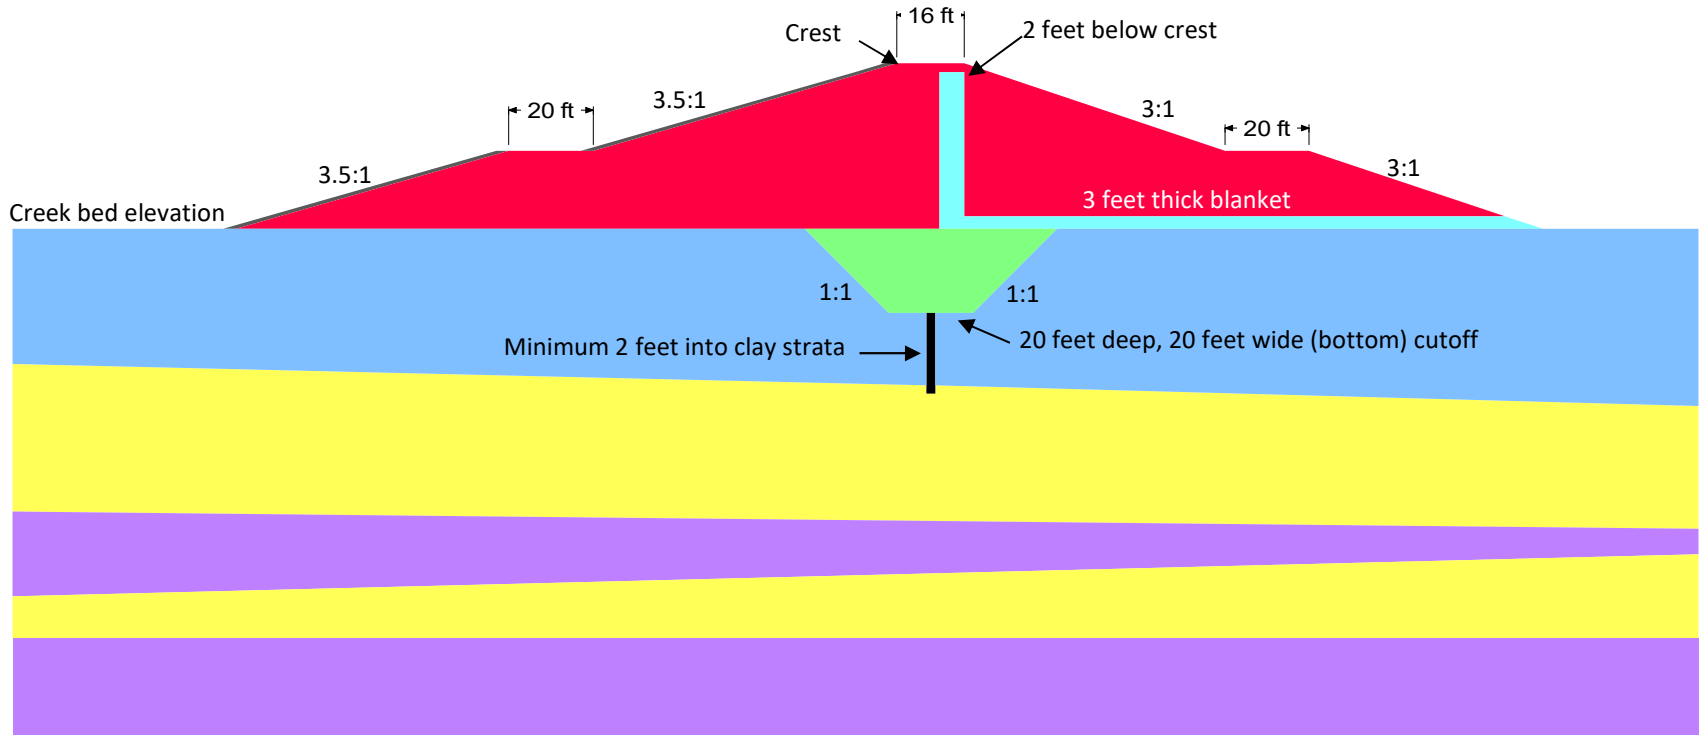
Alternative 1 Typical Section Used in Slope Stability Analysis
